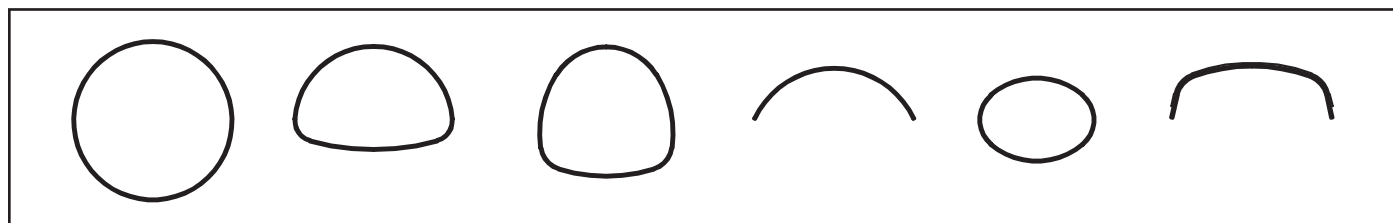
Round, Pipe Arch, Underpass, Arch, Ellipse, Box Culvert
